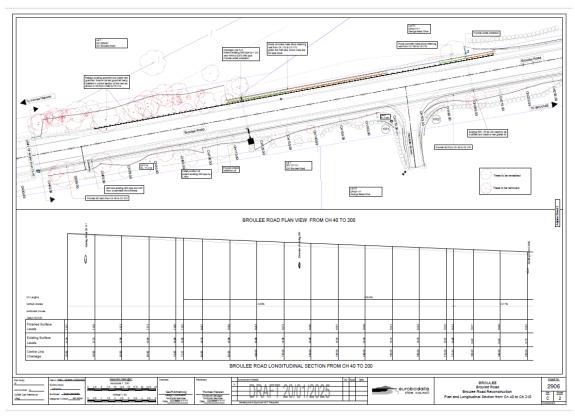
Broulee Rd Plan View from CH 40 to 200.
